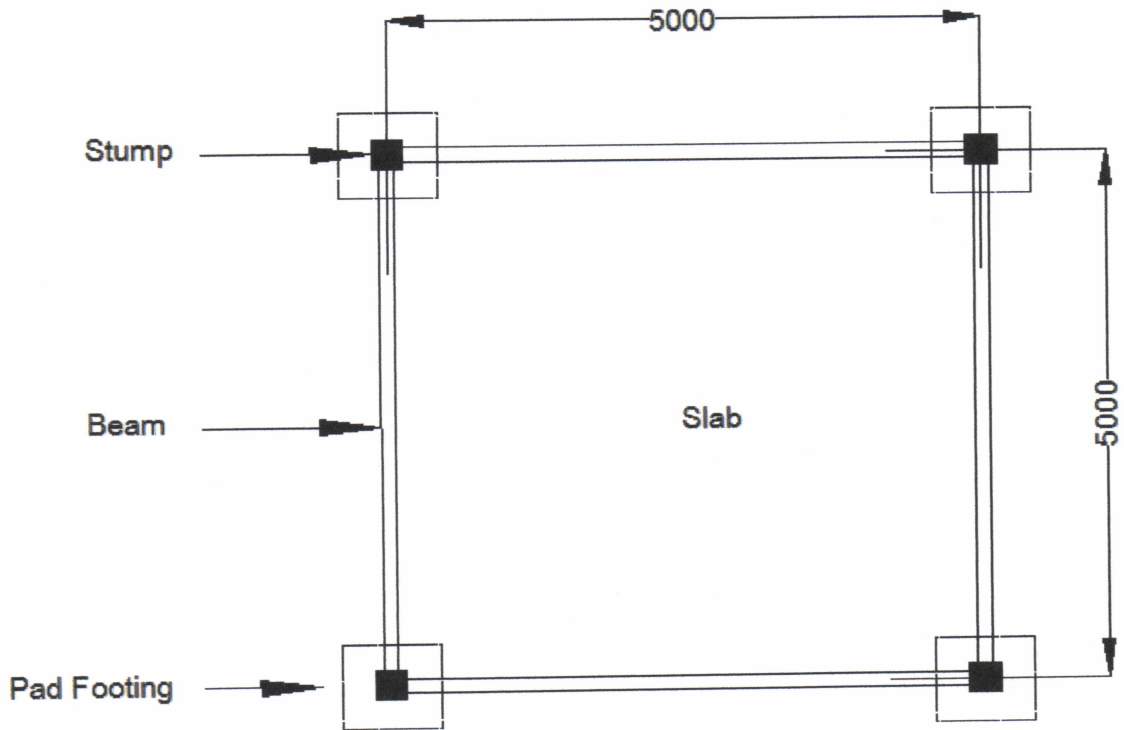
(a) GROUND FLOOR PLAN VIEW
